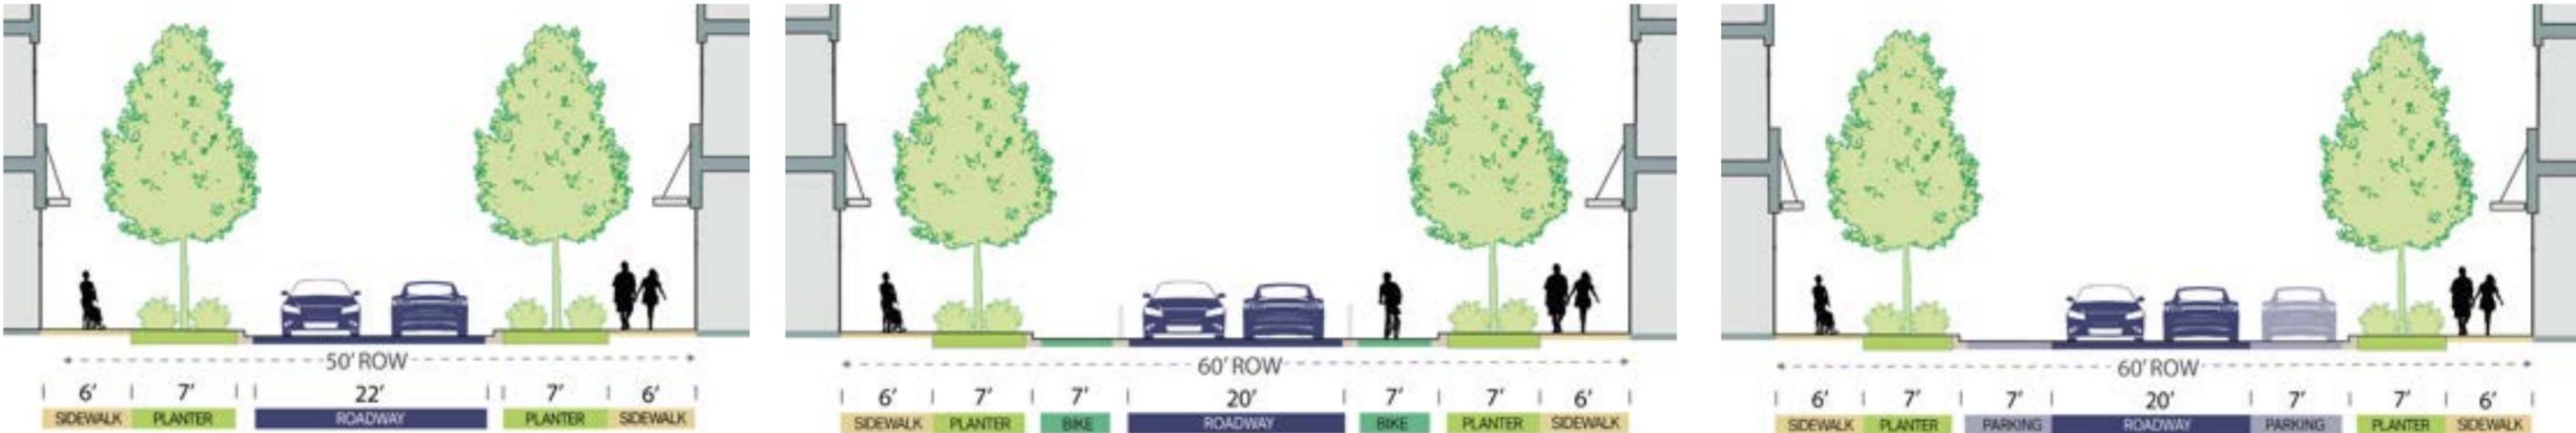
Imagery depicting typical cross sections of connecting major streets
